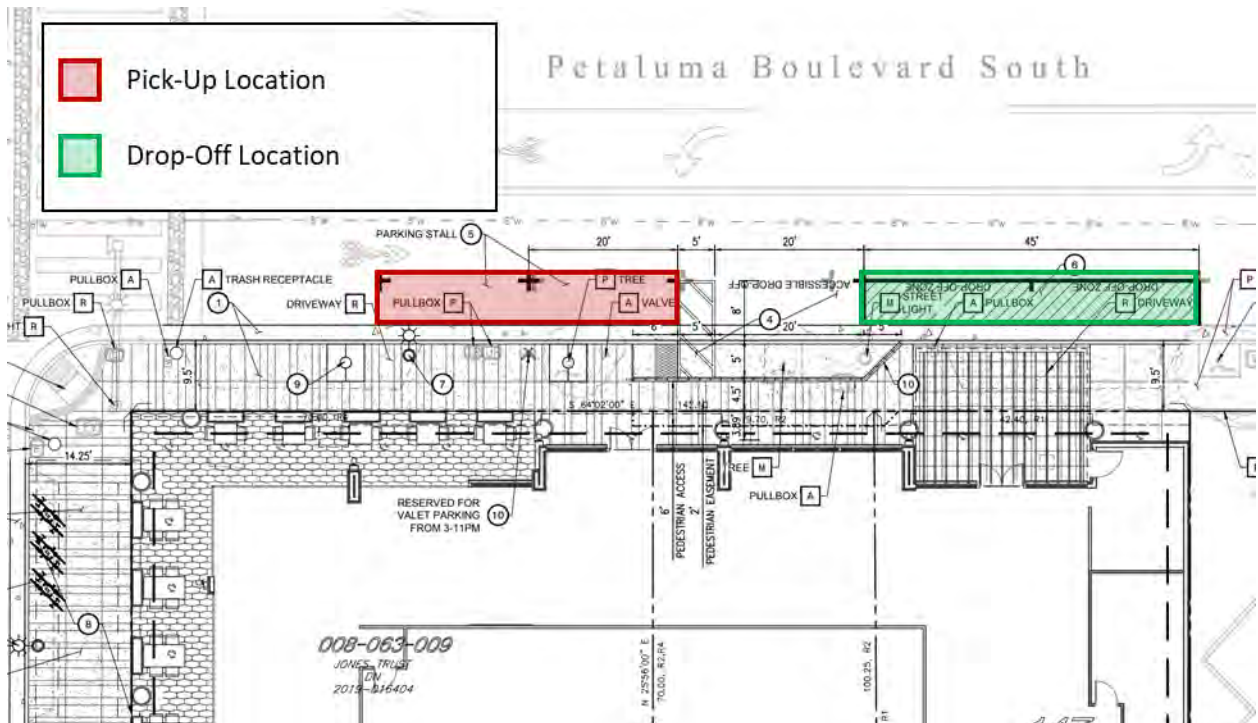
Site Plan detail highlighting the vehicular pick-up and drop-off location.
